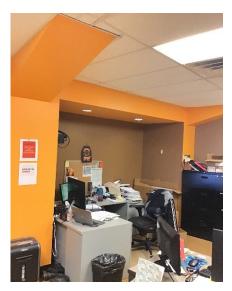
Wall And Ceiling Finishes, Service Level Office Area.
